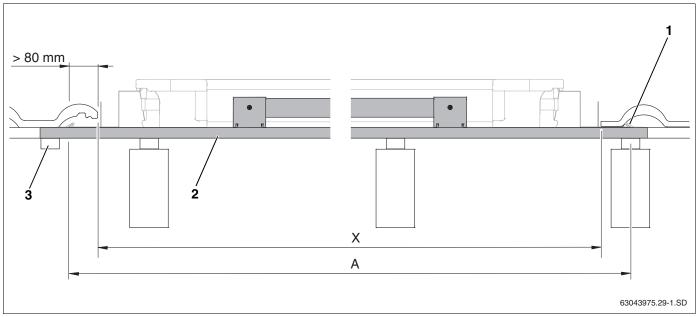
Length of additional roof battens (here: first lower roof batten with anti-slip protection)
